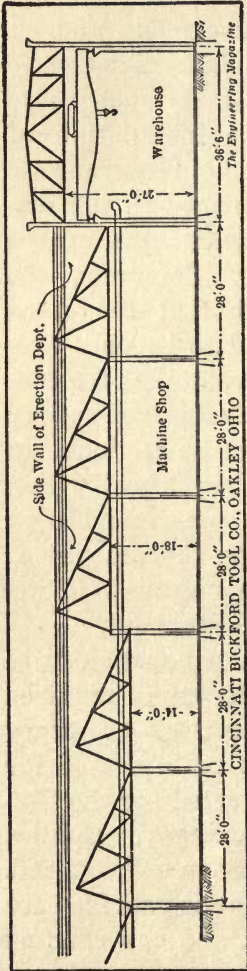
A TYPICAL CONSTRUCTION FOR A PLANT DEVOTED TO MODERATELY HEAVY SPECIAL MACHINE WORK.
